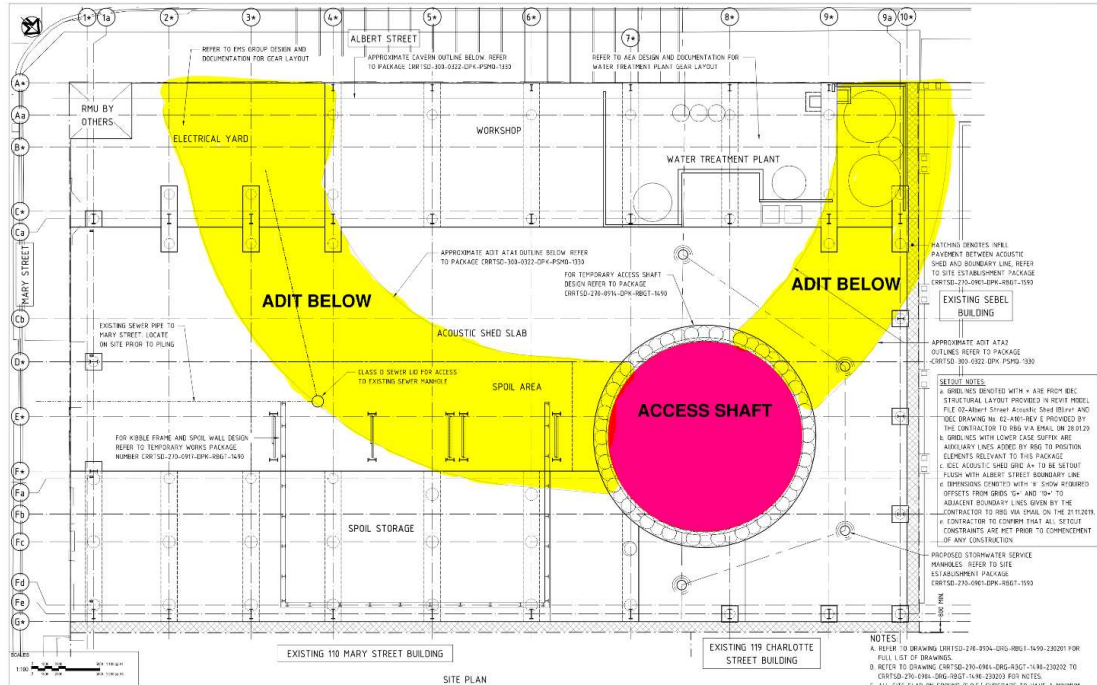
Plan Existing CRR Acoustic Shed Substructure
